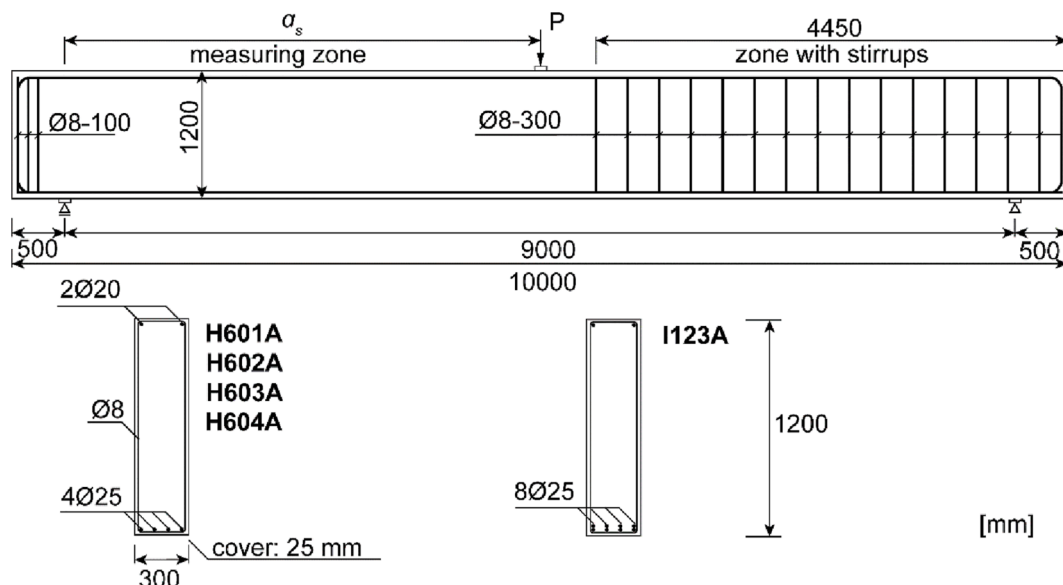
A sketch of beam configuration including beam dimension, reinforcement layout and locations of supports and load.
